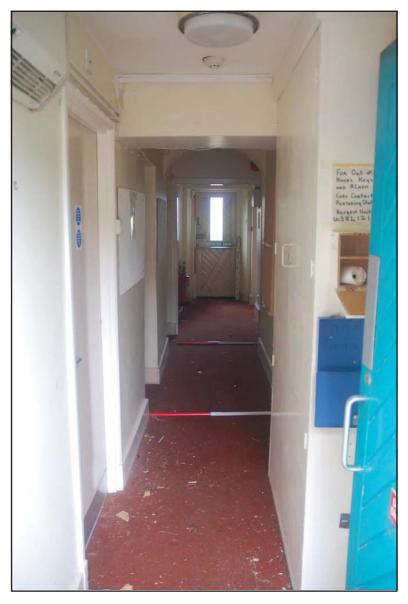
Administration Block (Internal): View northwest detailing main corridor through the building, with current main entrance in the background. This would have been the original building entrance prior to alterations in 1991. Scales: 2 x 1.0m
